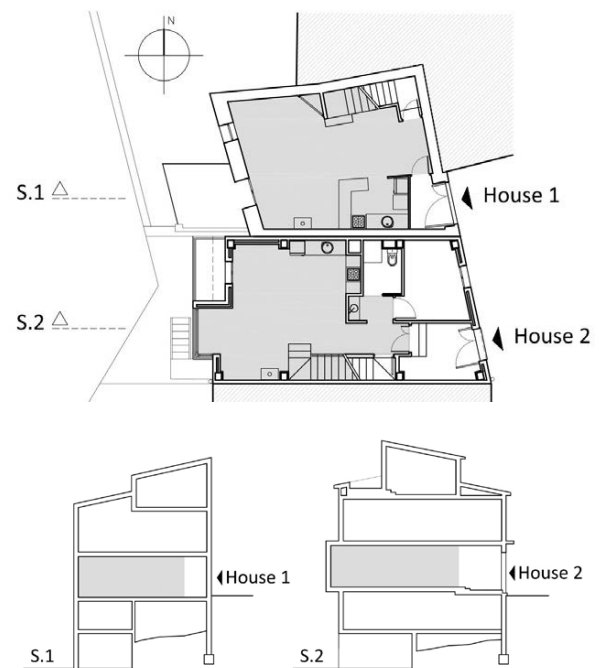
Floor plan and section of the houses (in grey, the studied area, the living room).
